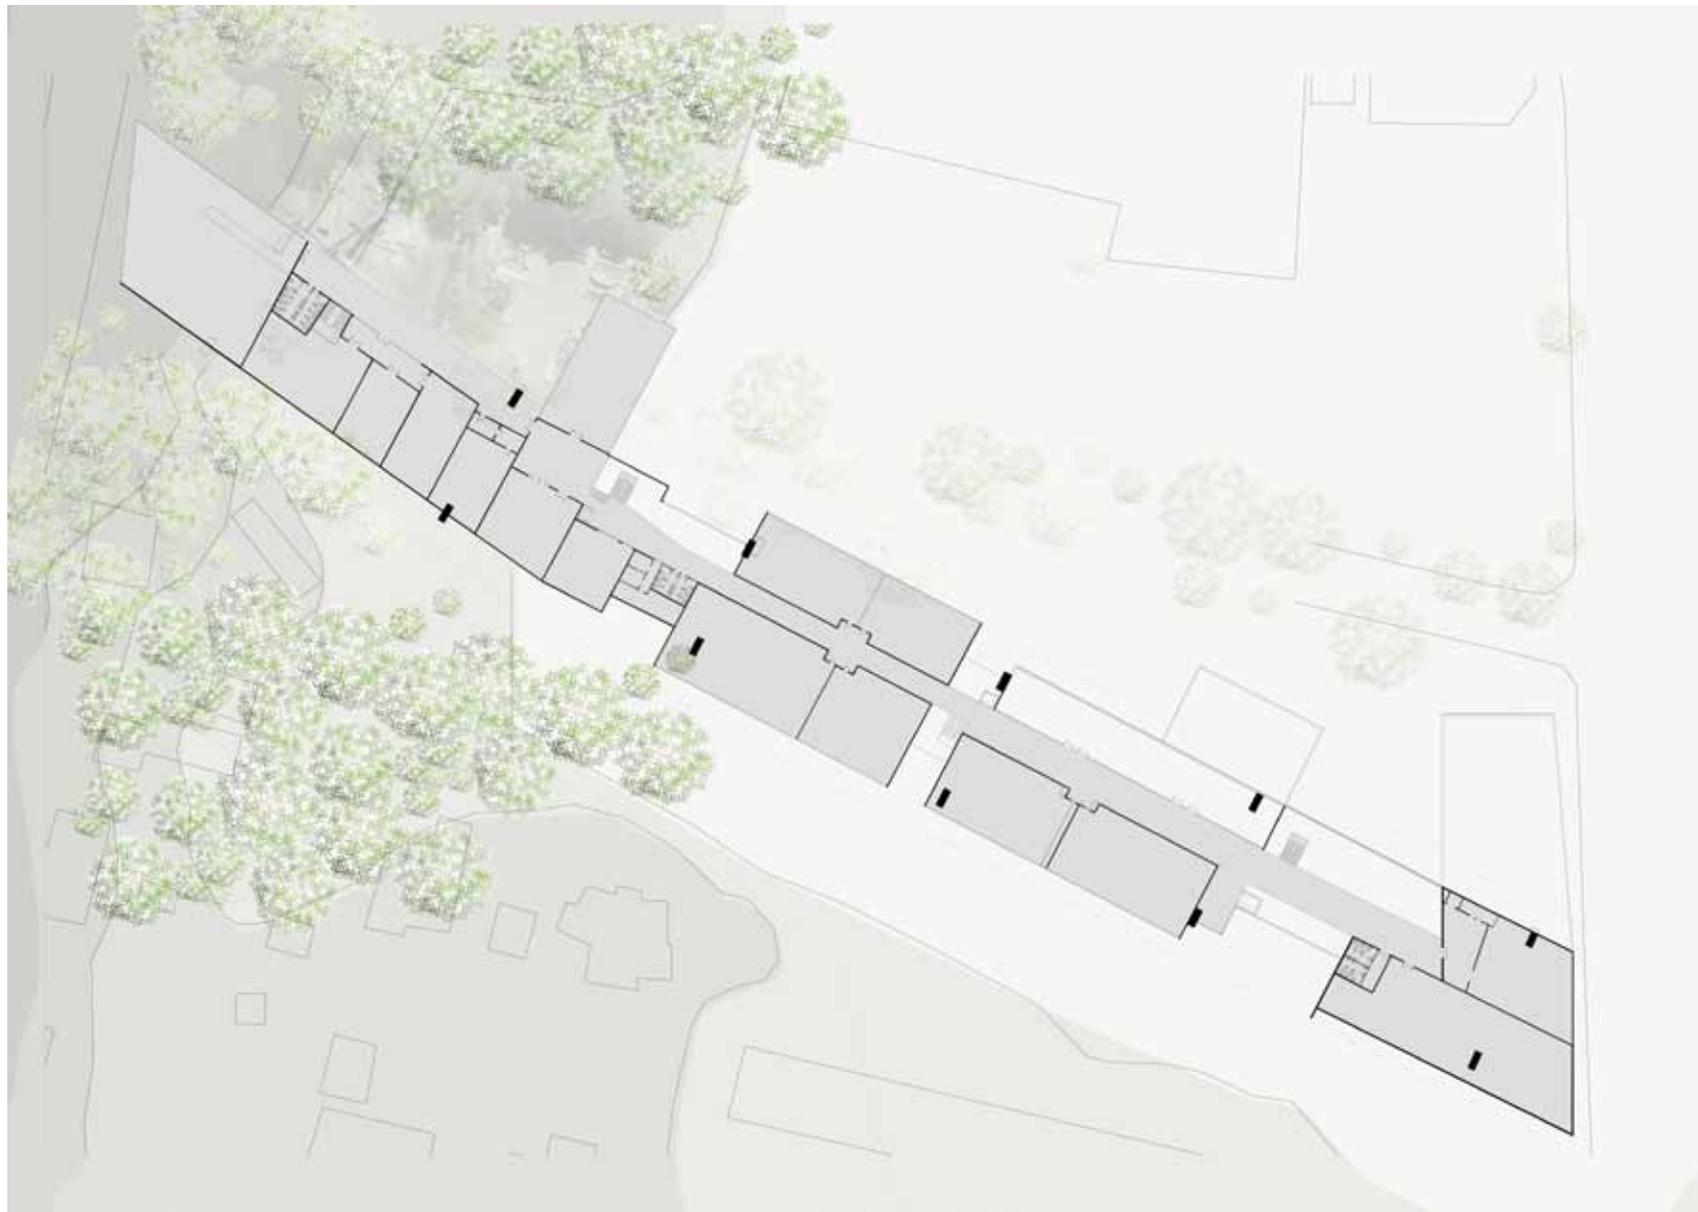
Final Design Presentation - Fourth Floor Plan
